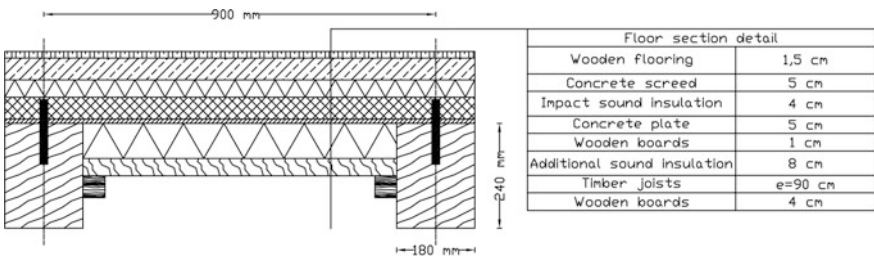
Existing timber beam strengthened with the concrete slab [65]
